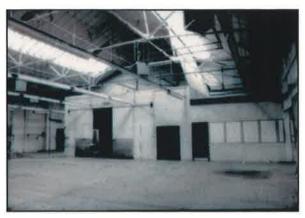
Area 6 looking south-west, with 6.2.2 in the background
